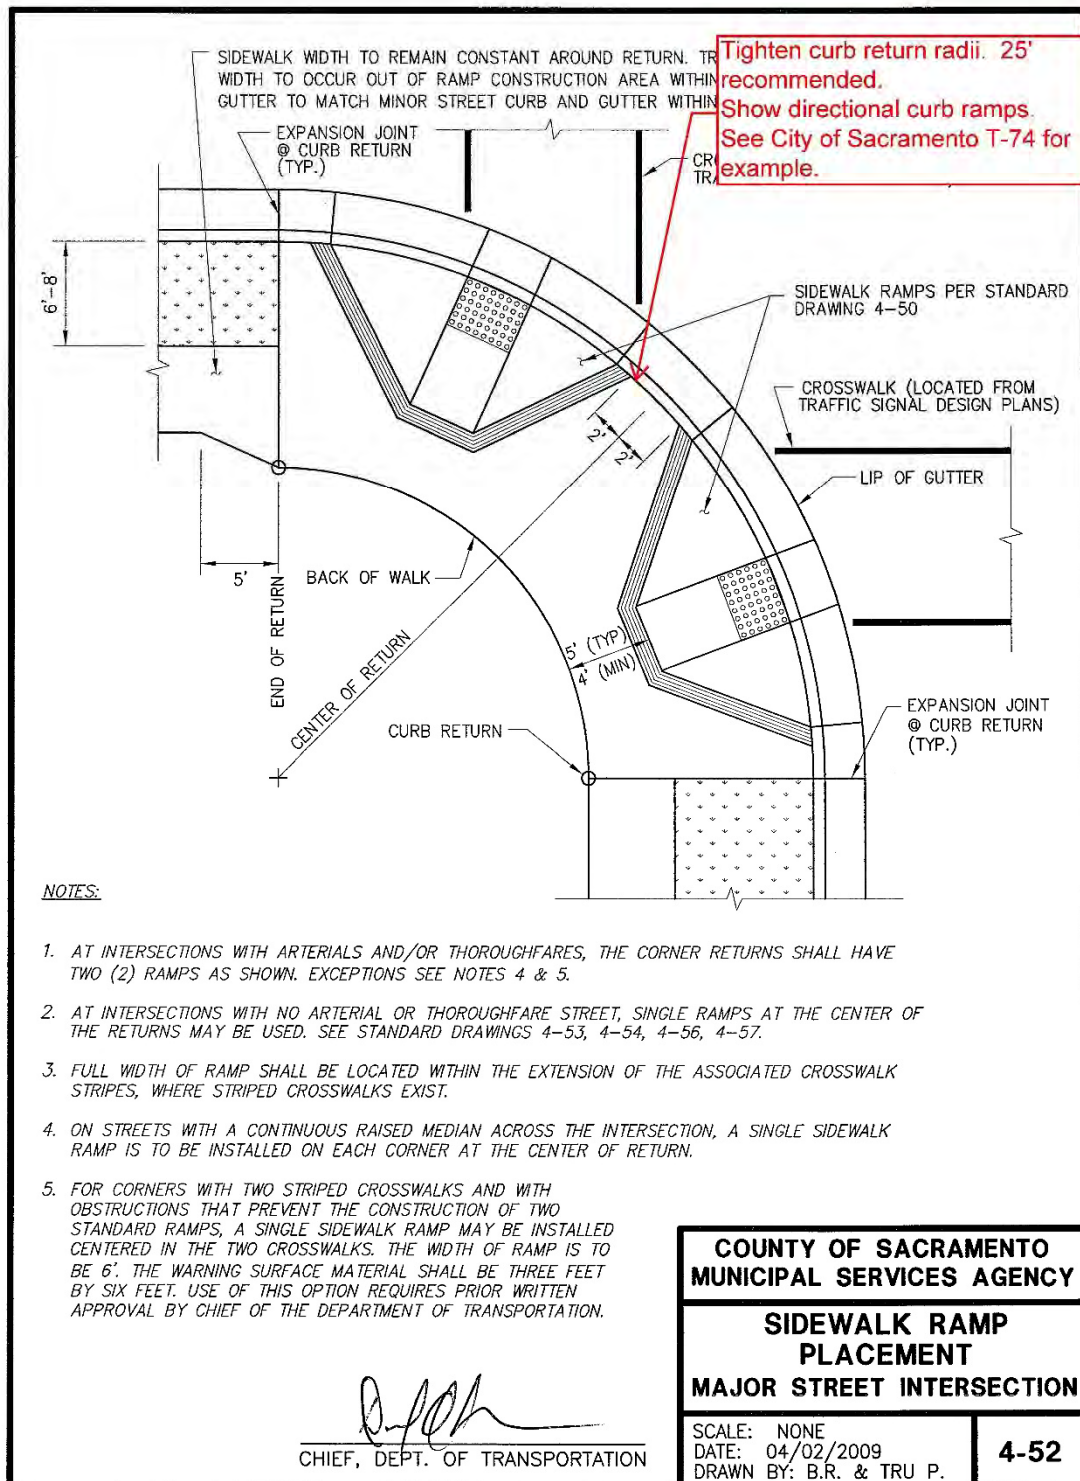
Standard Drawing Markup – Sidewalk Ramp Placement Major Street Intersection
